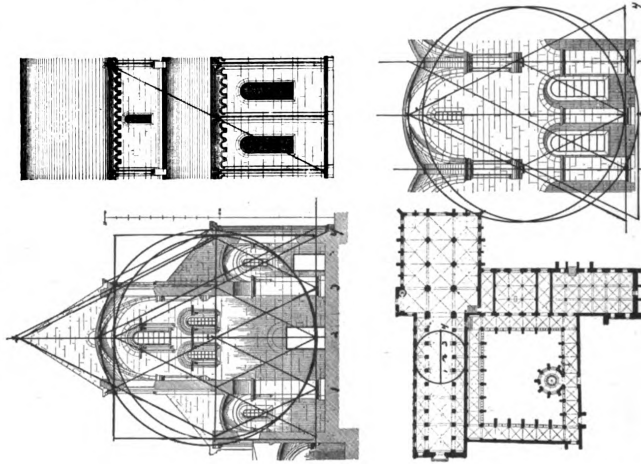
Abbey church of the Holy Cross, Vienna. Plan, transverse section, and part of longitudinal elevation inside and outside, analysis.
